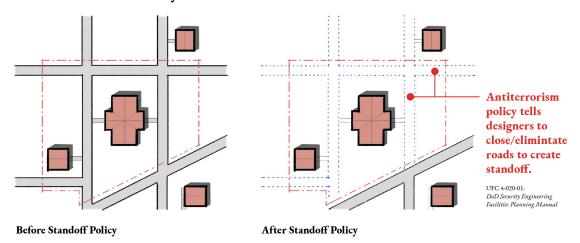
Road closure to create standoff. From UFC 4-020-01, DoD Security Engineering Facilities Planning Manual, Figure 5-5, "Road Closure to Create Standoff." Re-drawn by author.
